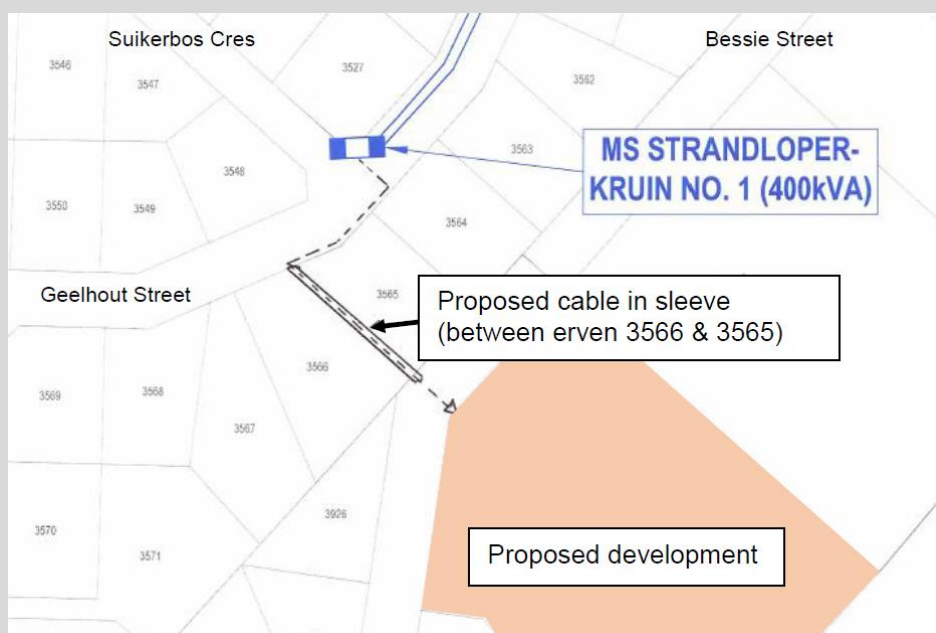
Proposed underground cabling from Strandloper mini-substation in Geelhout Street to Bessie Street to service the development site.
